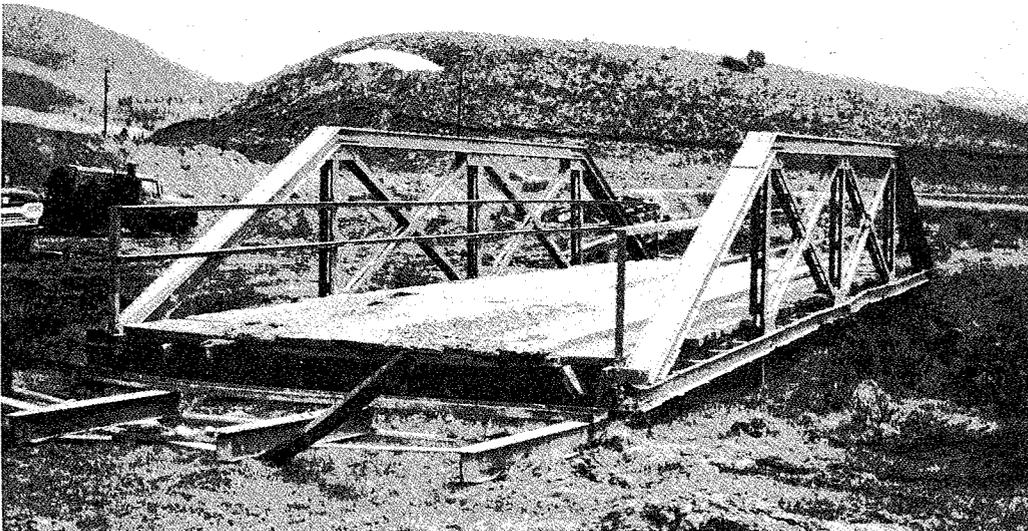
Original steel truss bridge across Red Mountain Creek. Inventory rating for HS loading is 3.3 tons.
